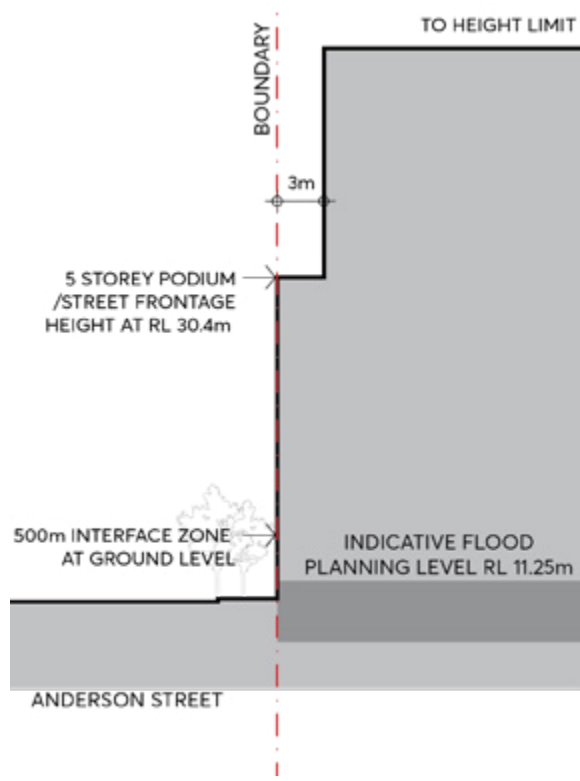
Anderson Street (East) Street Wall
